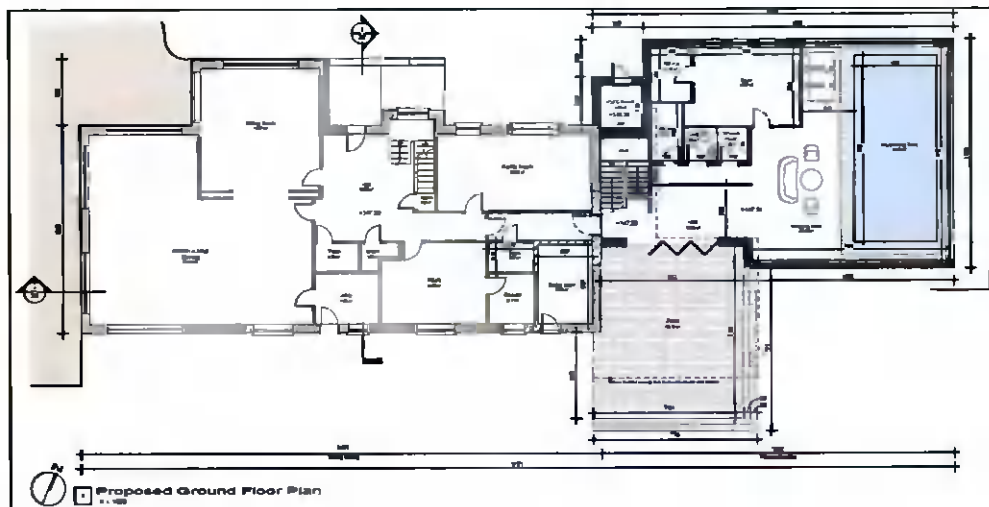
Proposed Ground Floor Plans (Drawing No. 103).
